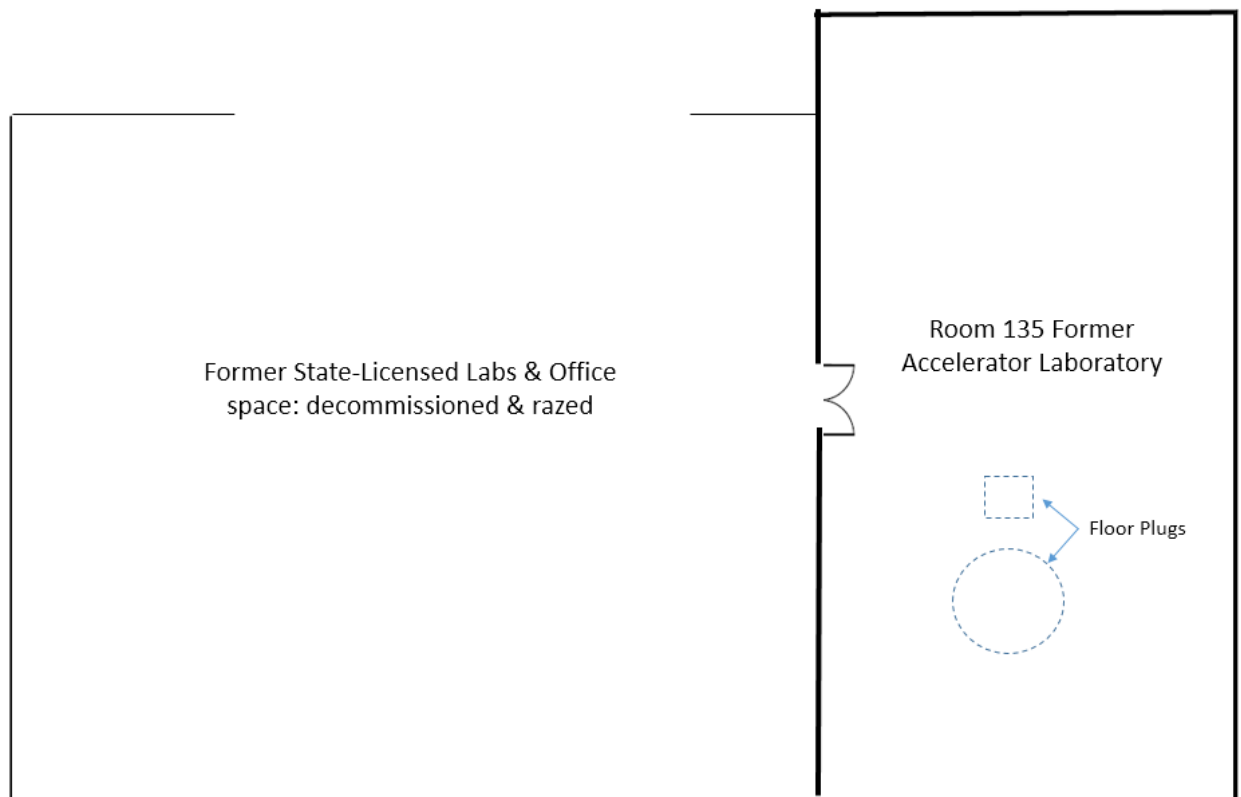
First Floor Layout. (Room135: ~27 ft by ~48 ft)
